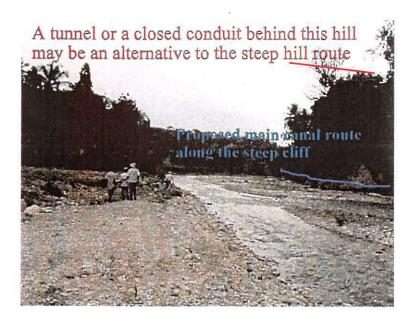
A steep cliff on the west bank will be a difficult task to route the main canal as proposed. An alternative would be to install a closed conduit or a tunnel behind the hill. This section of the proposed main canal is relatively short.
